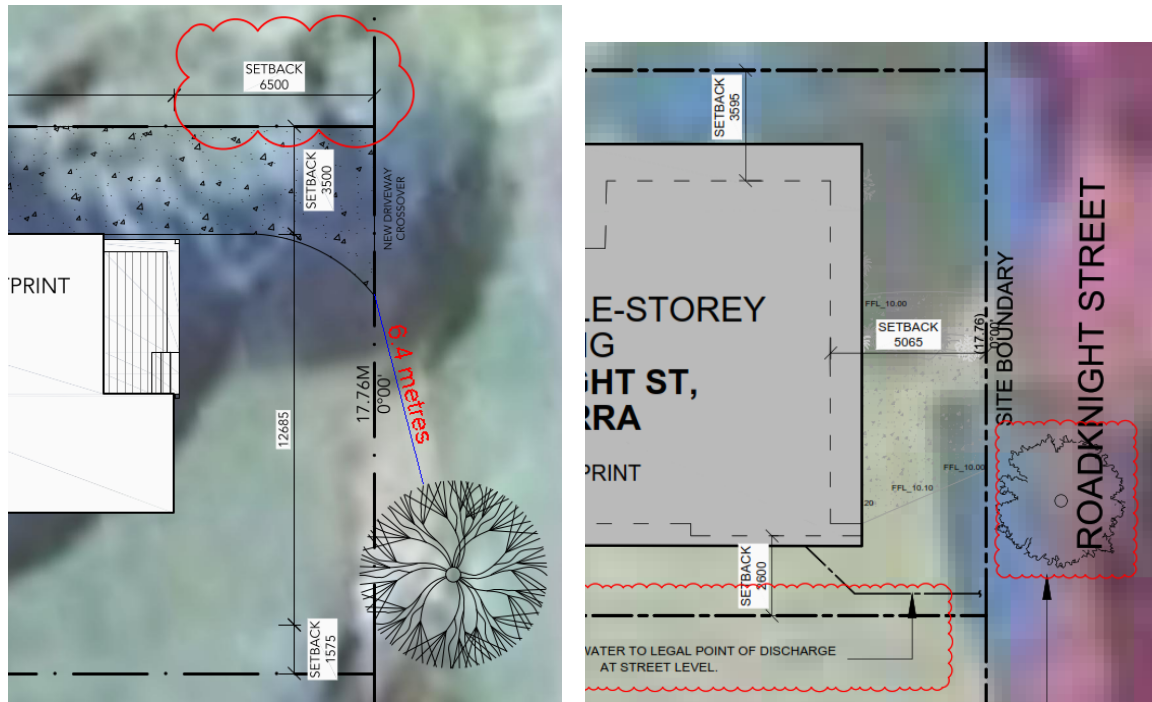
Plan for Amendment application (left), and plan endorsed for original application (right)
